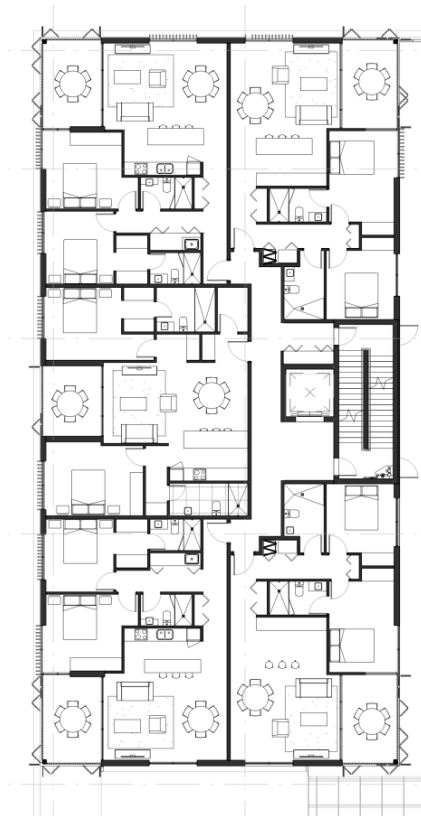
Apartment Tower Floor Plans (Level 3 to Level 6)
